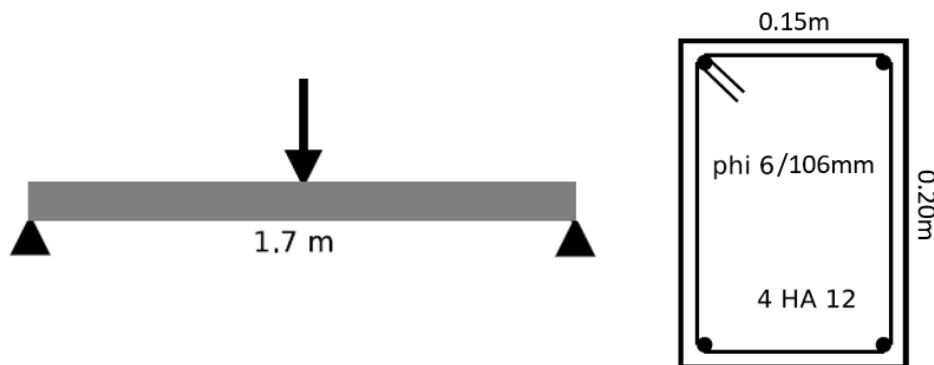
RC simply supported beam: geometry and reinforcement details (Lebon 2011).
